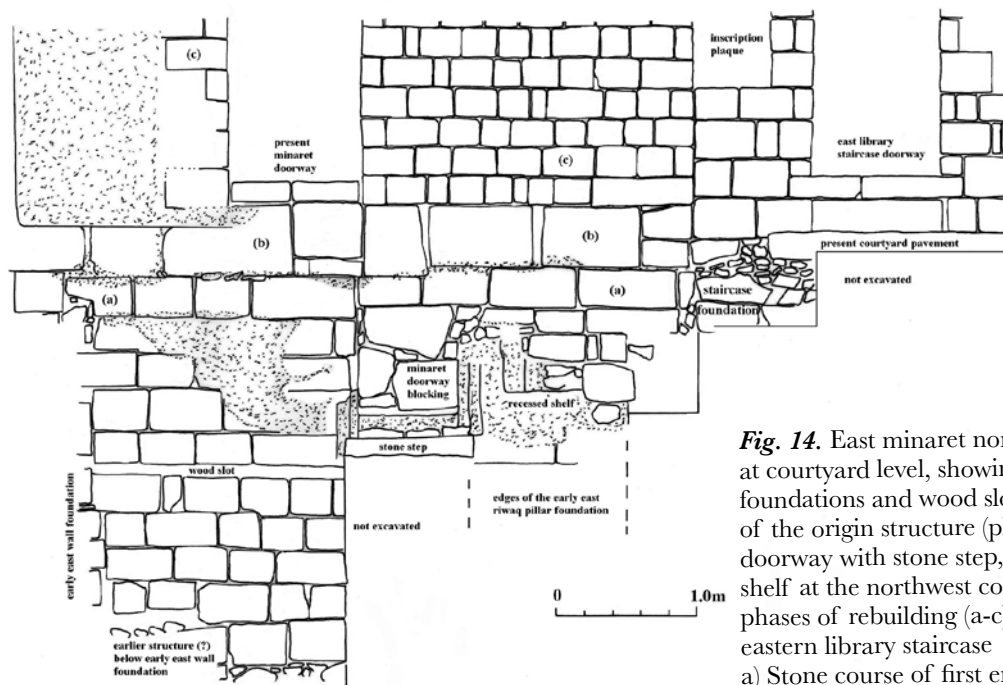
East minaret north elevation at courtyard level, showing original foundations and wood slot, elements of the origin structure (plaster-framed doorway with stone step, recessed shelf at the northwest corner), three phases of rebuilding (a-c) and the eastern library staircase
